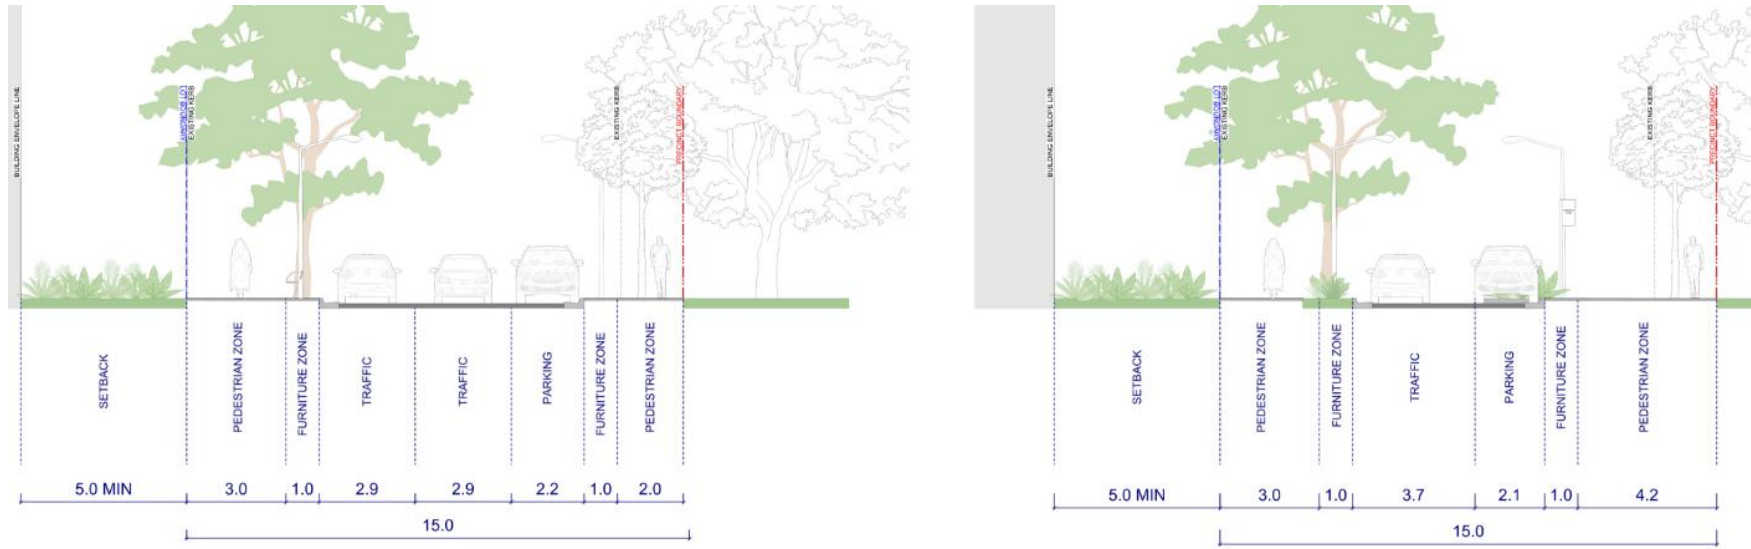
Street Section - Pitt Street Extension (Aspect Studios)
